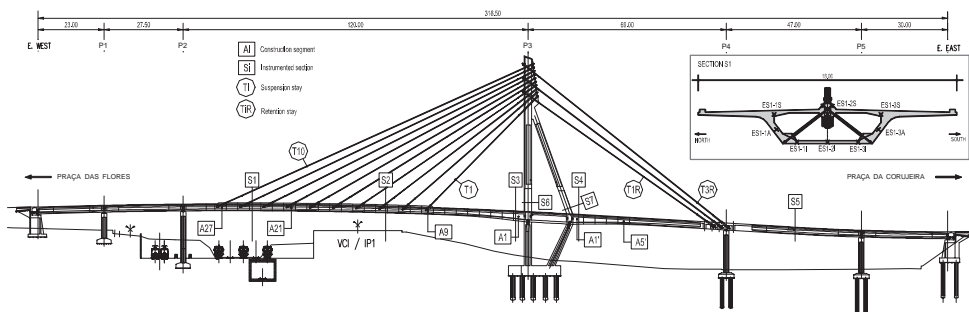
General geometry of the cable stayed viaduct. Location of the instrumented sections (S1 to S7).
